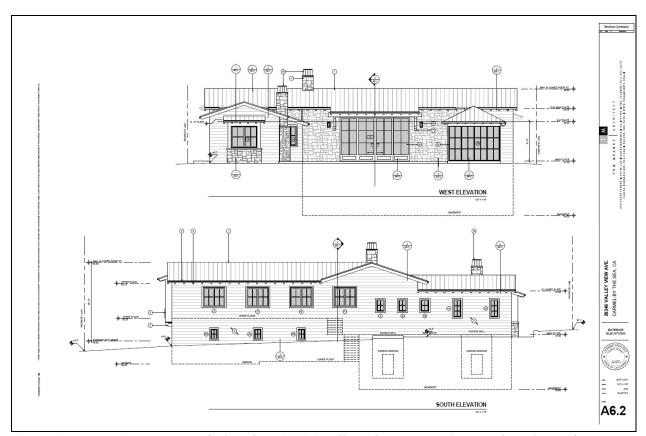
Elevations: Proposed Elevations 26346 Valley View Avenue (west and south exterior elevations).
